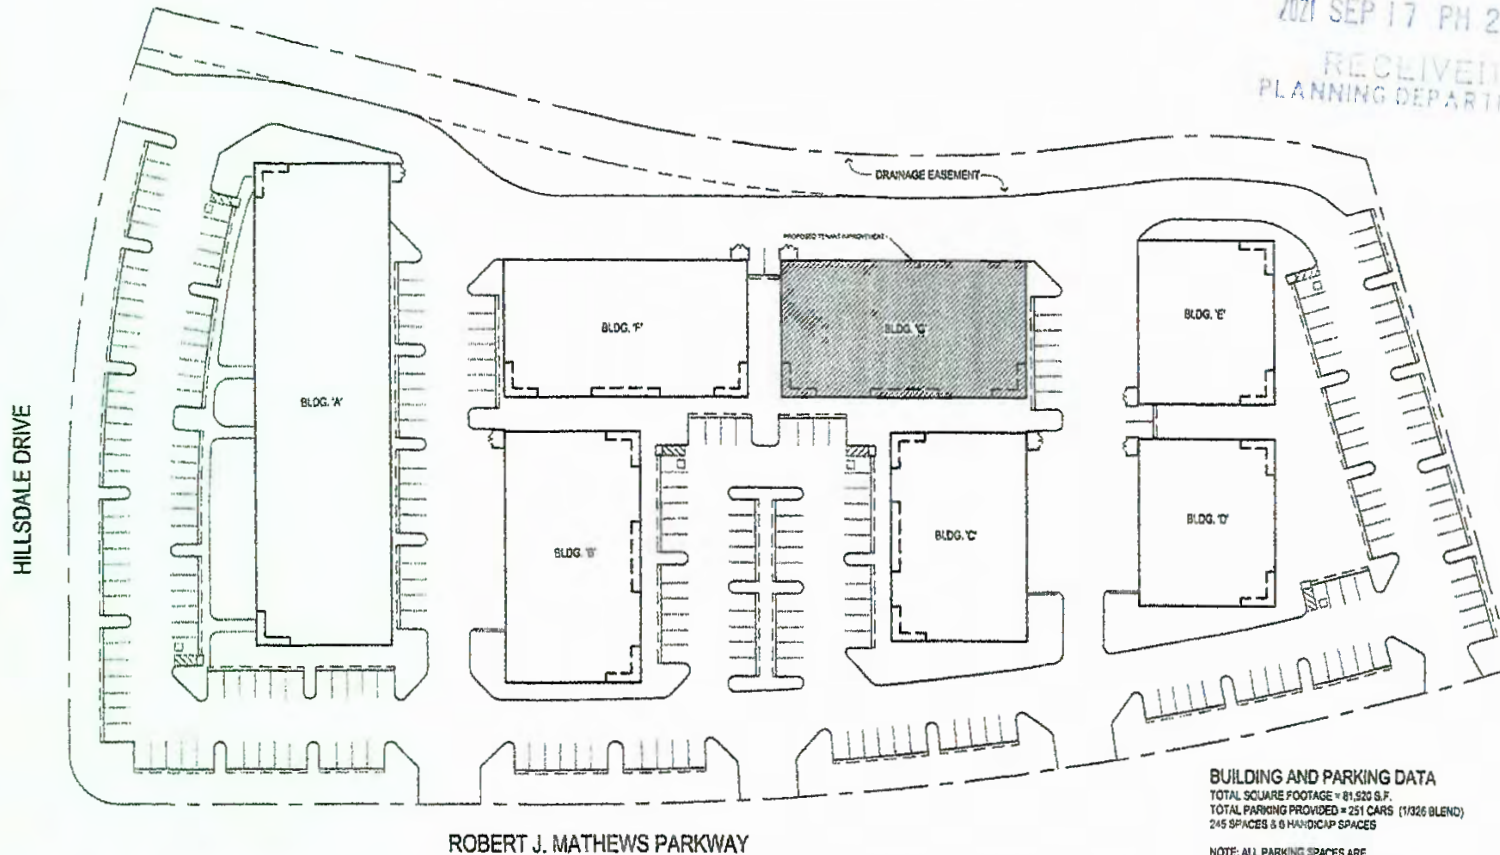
Site Plan/Floor Plan CCUP21-0005/Norcanna Distribution and Delivery
